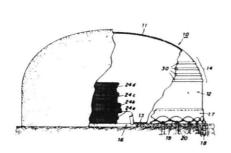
Drawing excerpt from the patent of Wallace Neff. /8/. Fig.8: One of Harrington's shells during construction.
